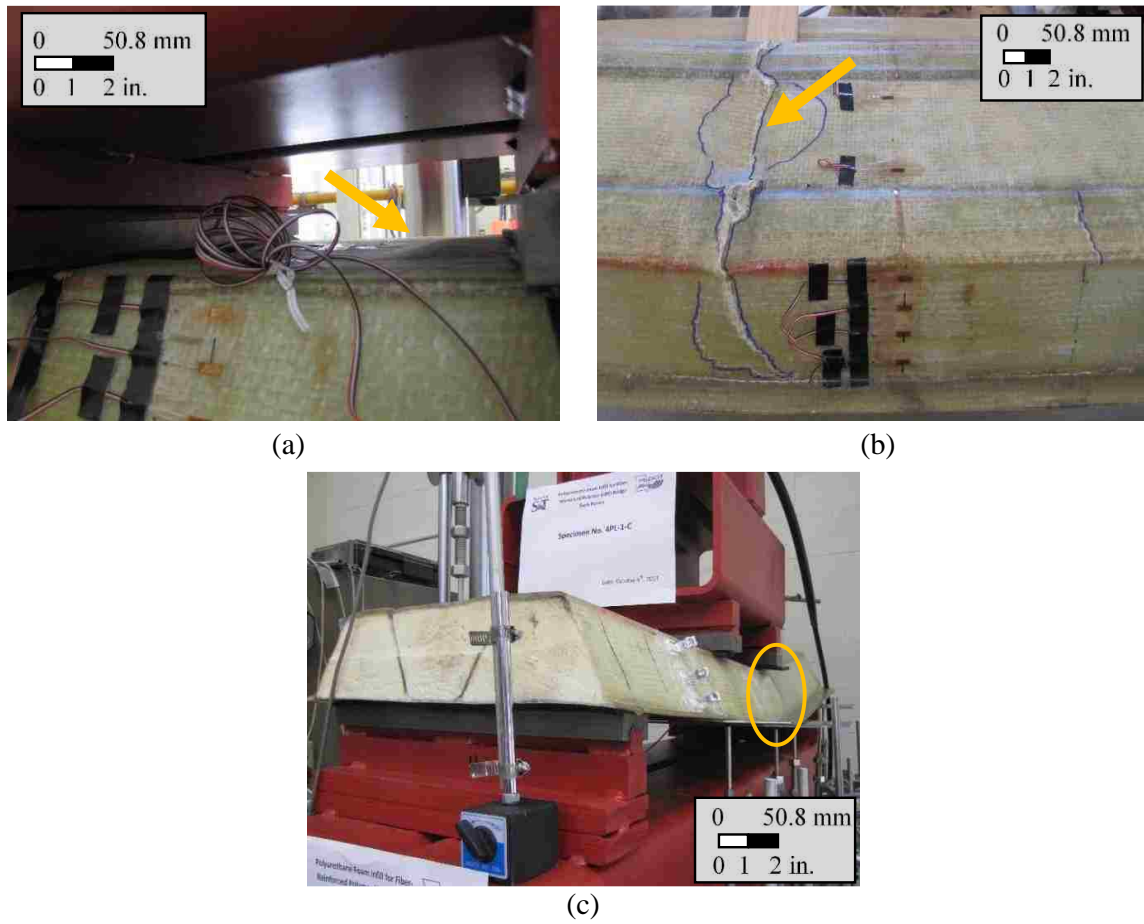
Failure modes: (a) initial failure due to outward compression facing wrinkling, (b) ultimate failure due to compression failure of the facing under loading point, and (c) final failure mode triggered by crushing
